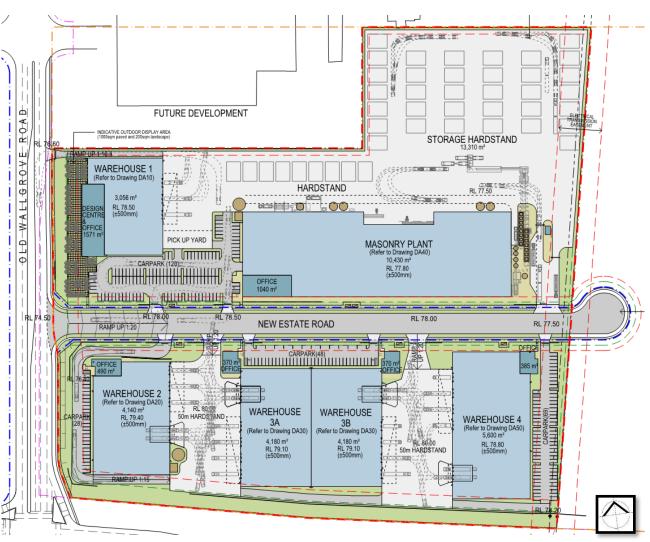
Oakdale East Estate Plan – Austral Masonry Plant & Warehouse Development
